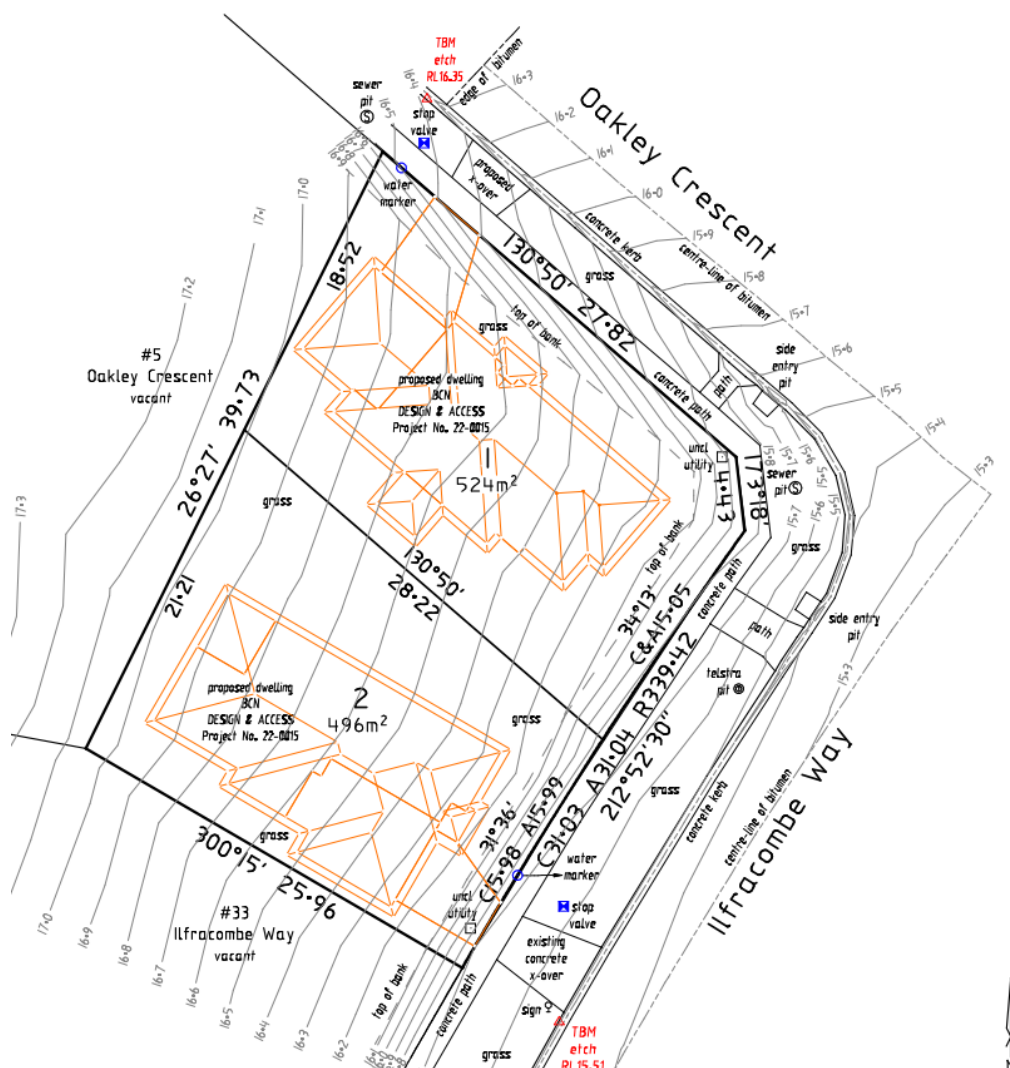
Proposed plan of subdivision and dwellings – Oneplan
